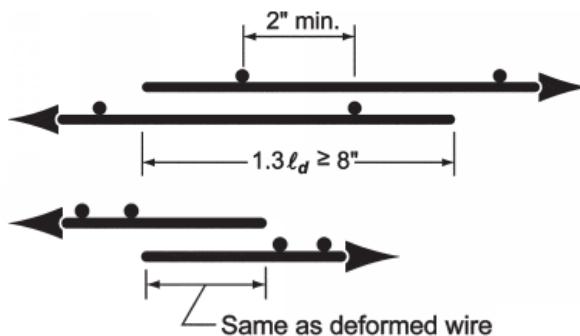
Lap Splices of Deformed Welded Wire Reinforcement (adapted from ACI 318-14, courtesy of ACI)
